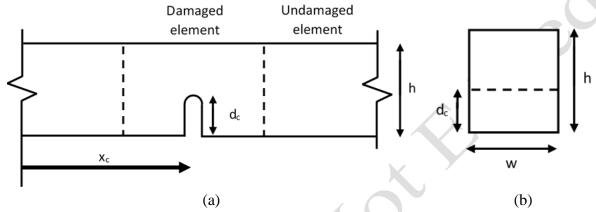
Crack considered at the component (a) longitudinal section (b) cross section
